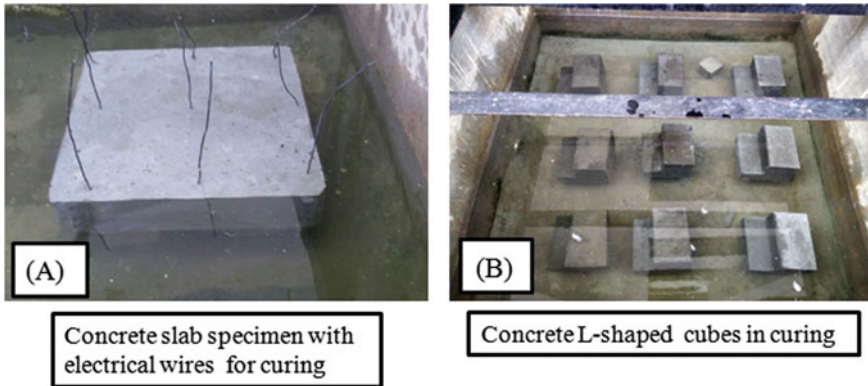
Curing of RCC slab specimen and L-Shaped concrete cube
